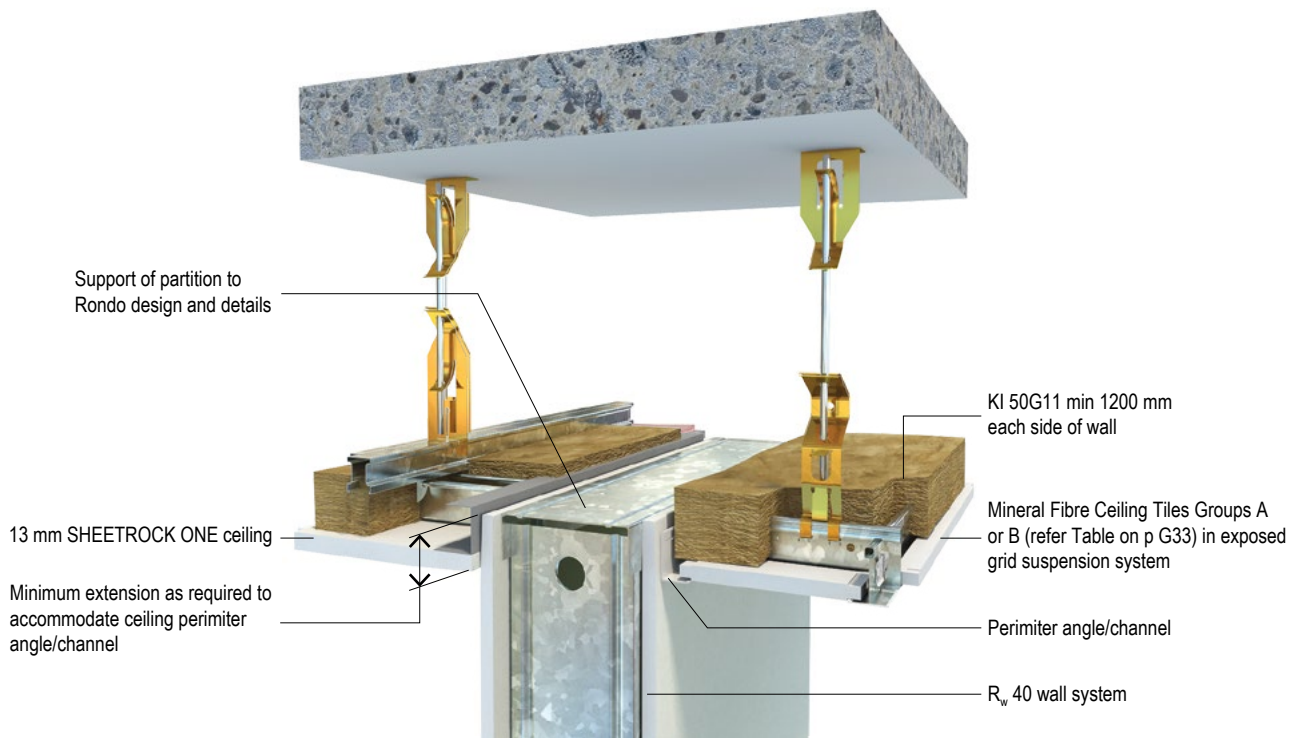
Ceiling configuration to maintain an  $R_w$  40 wall acoustic rating
